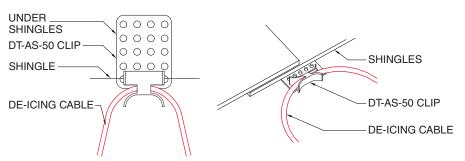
De-icing cable on sloped asphalt eave only. This layout typically uses DT-AS-50 clips with SB-190 adhesive on roof, and RM-25-AL clips with VHB adhesive pads for drip loop in gutter.
